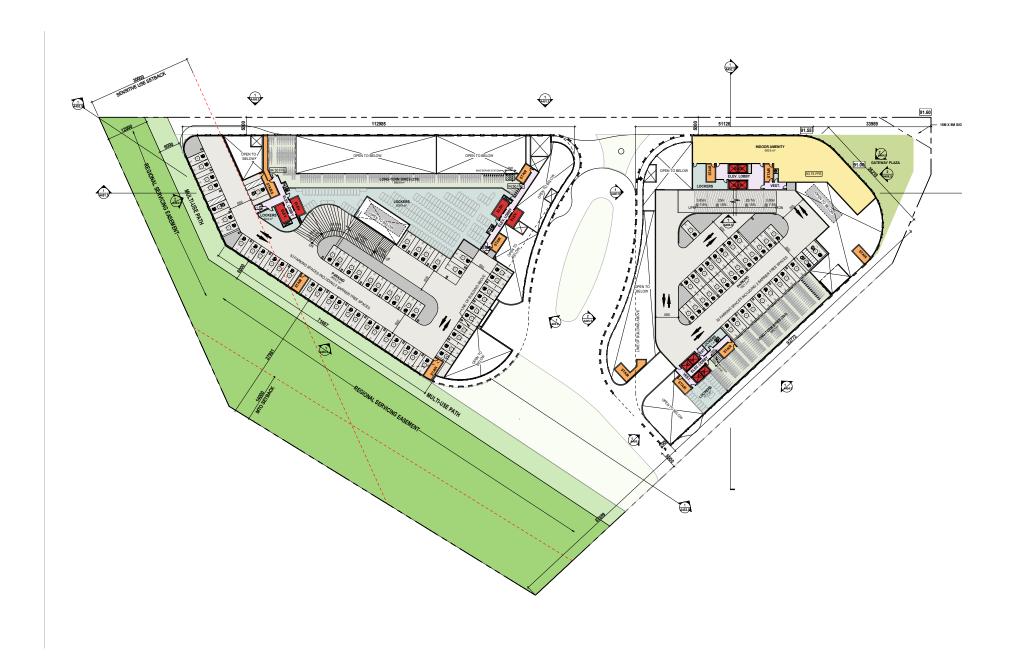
Mezzanine Floor Plan (BDP. QUADRANGLE ARCHITECTS LTD.)
